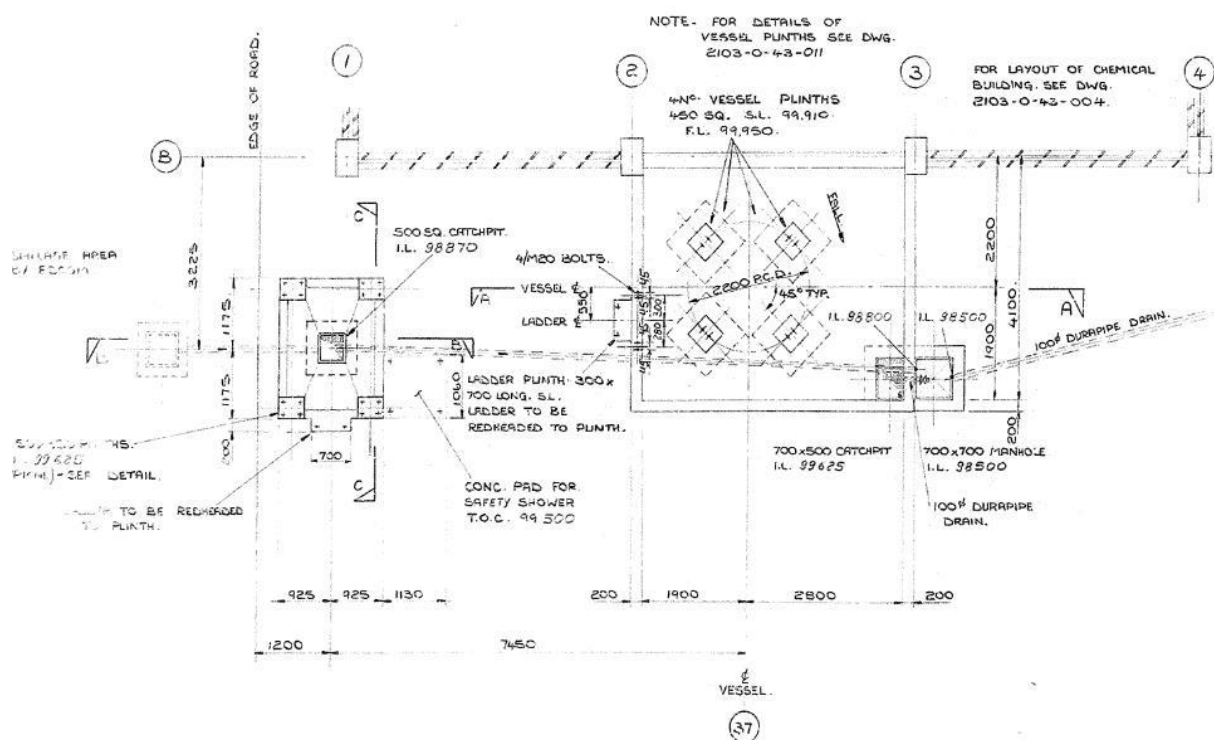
Showing the layout of the North WTP offloading area as well as the bund area
